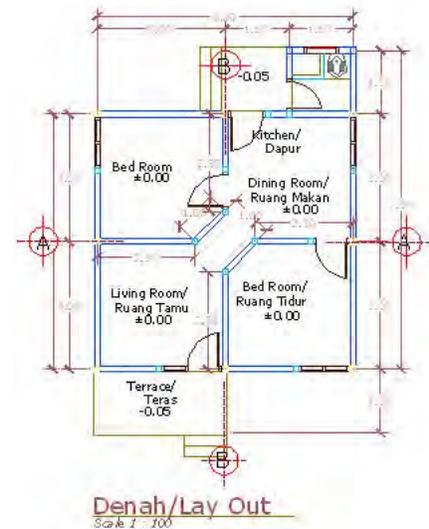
Build Change Pilot Project House, 2 bedroom, living room, dining room, with toilet outside.
